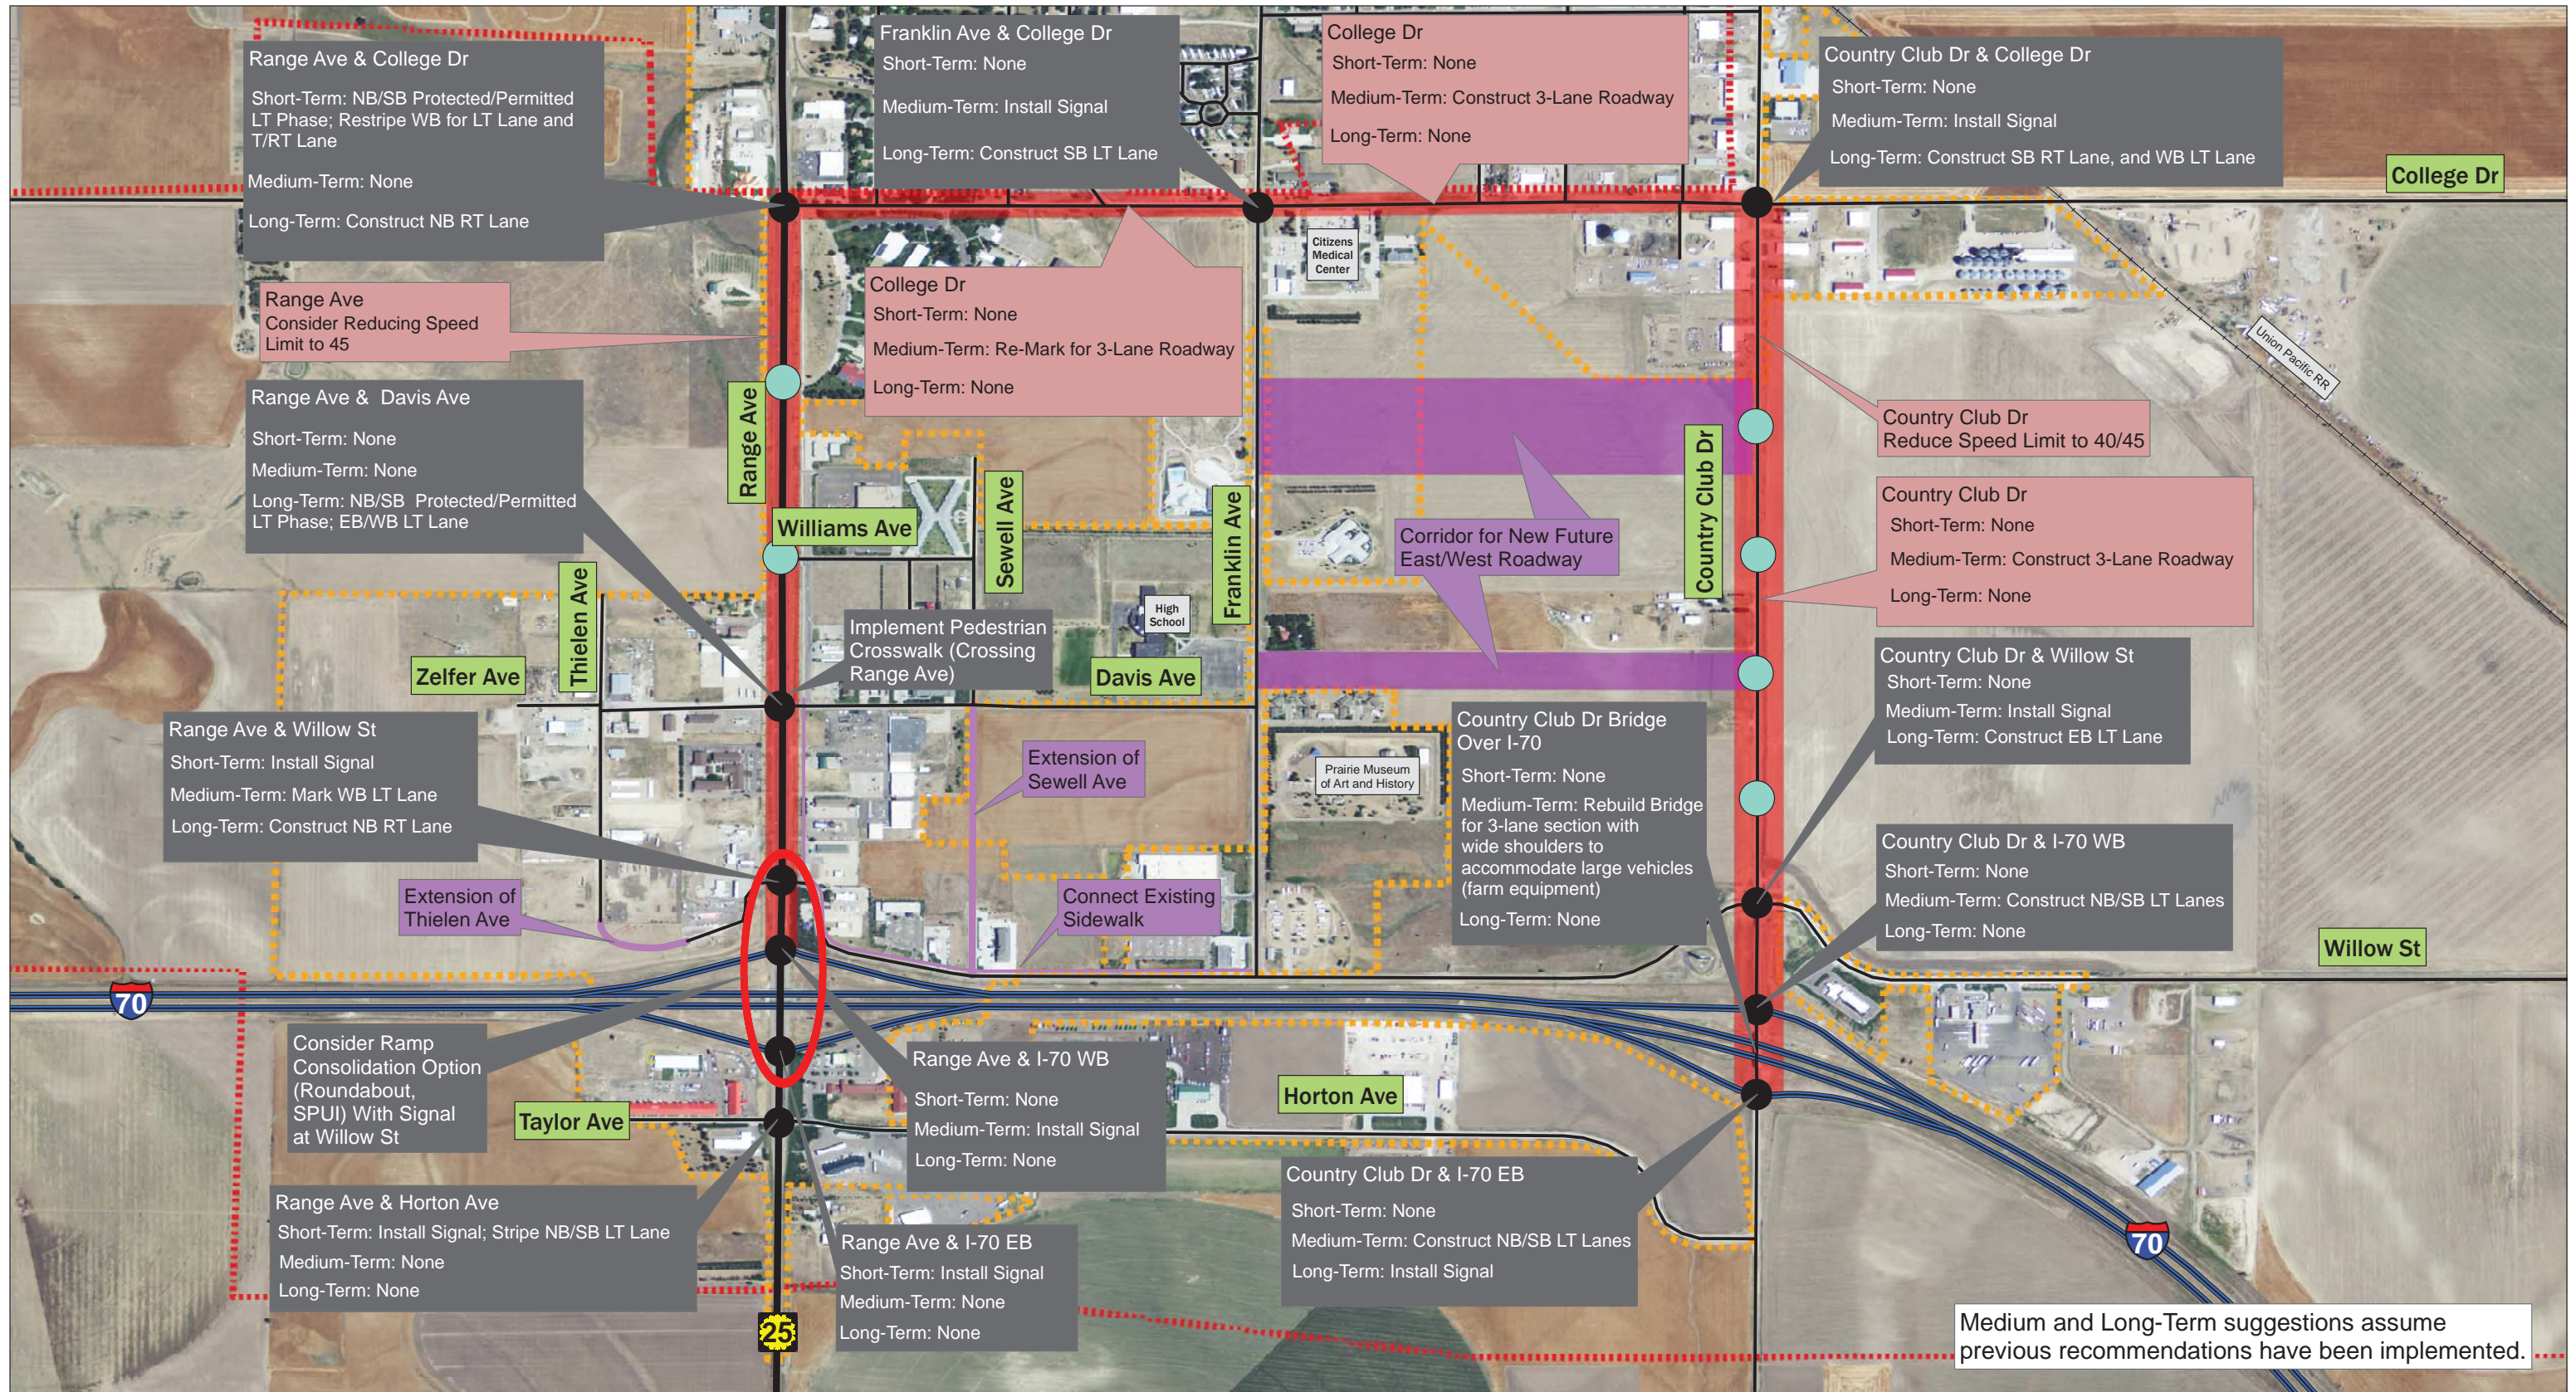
RECOMMENDED IMPROVEMENT PLAN
